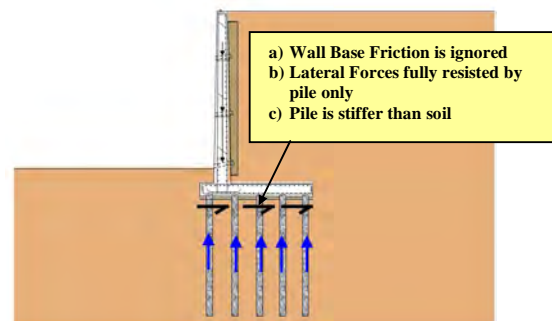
Reinforced Concrete (RC) Wall Supported with Piled Foundation
